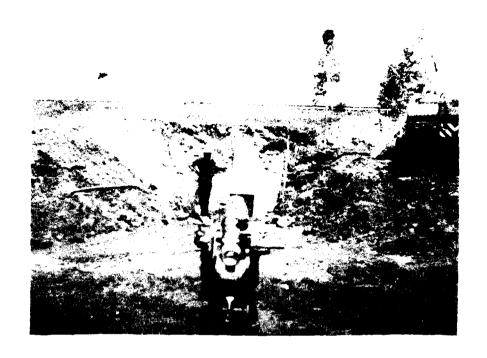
Alignment for boring under Highway 93 (July 5, 1984)
